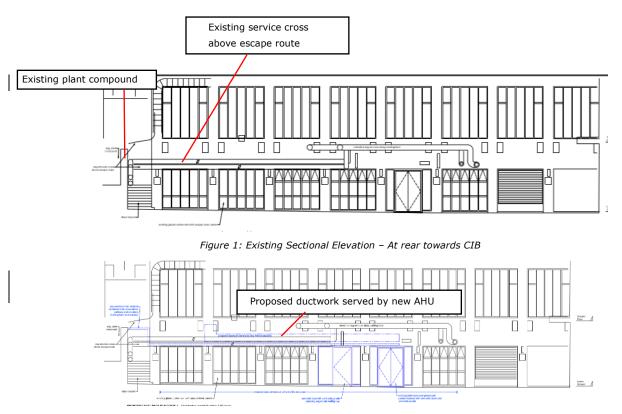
Proposed Sectional Elevation – At rear towards CIB
